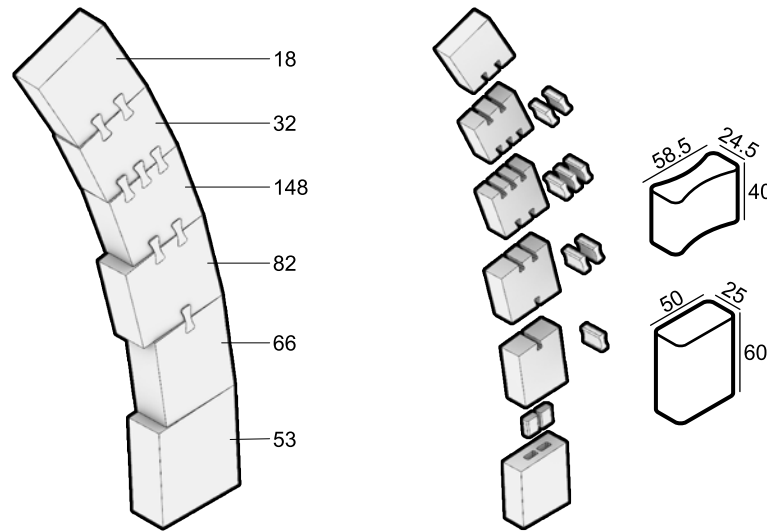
3D Model of the demonstrator. Left: Assembled alignment with offcut ids. Right: Exploded alignment showcasing the joints with their dimensions.
